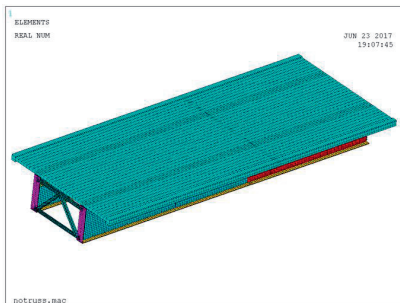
Bridge segment of the bridge from the above, no horizontal truss is showed.
